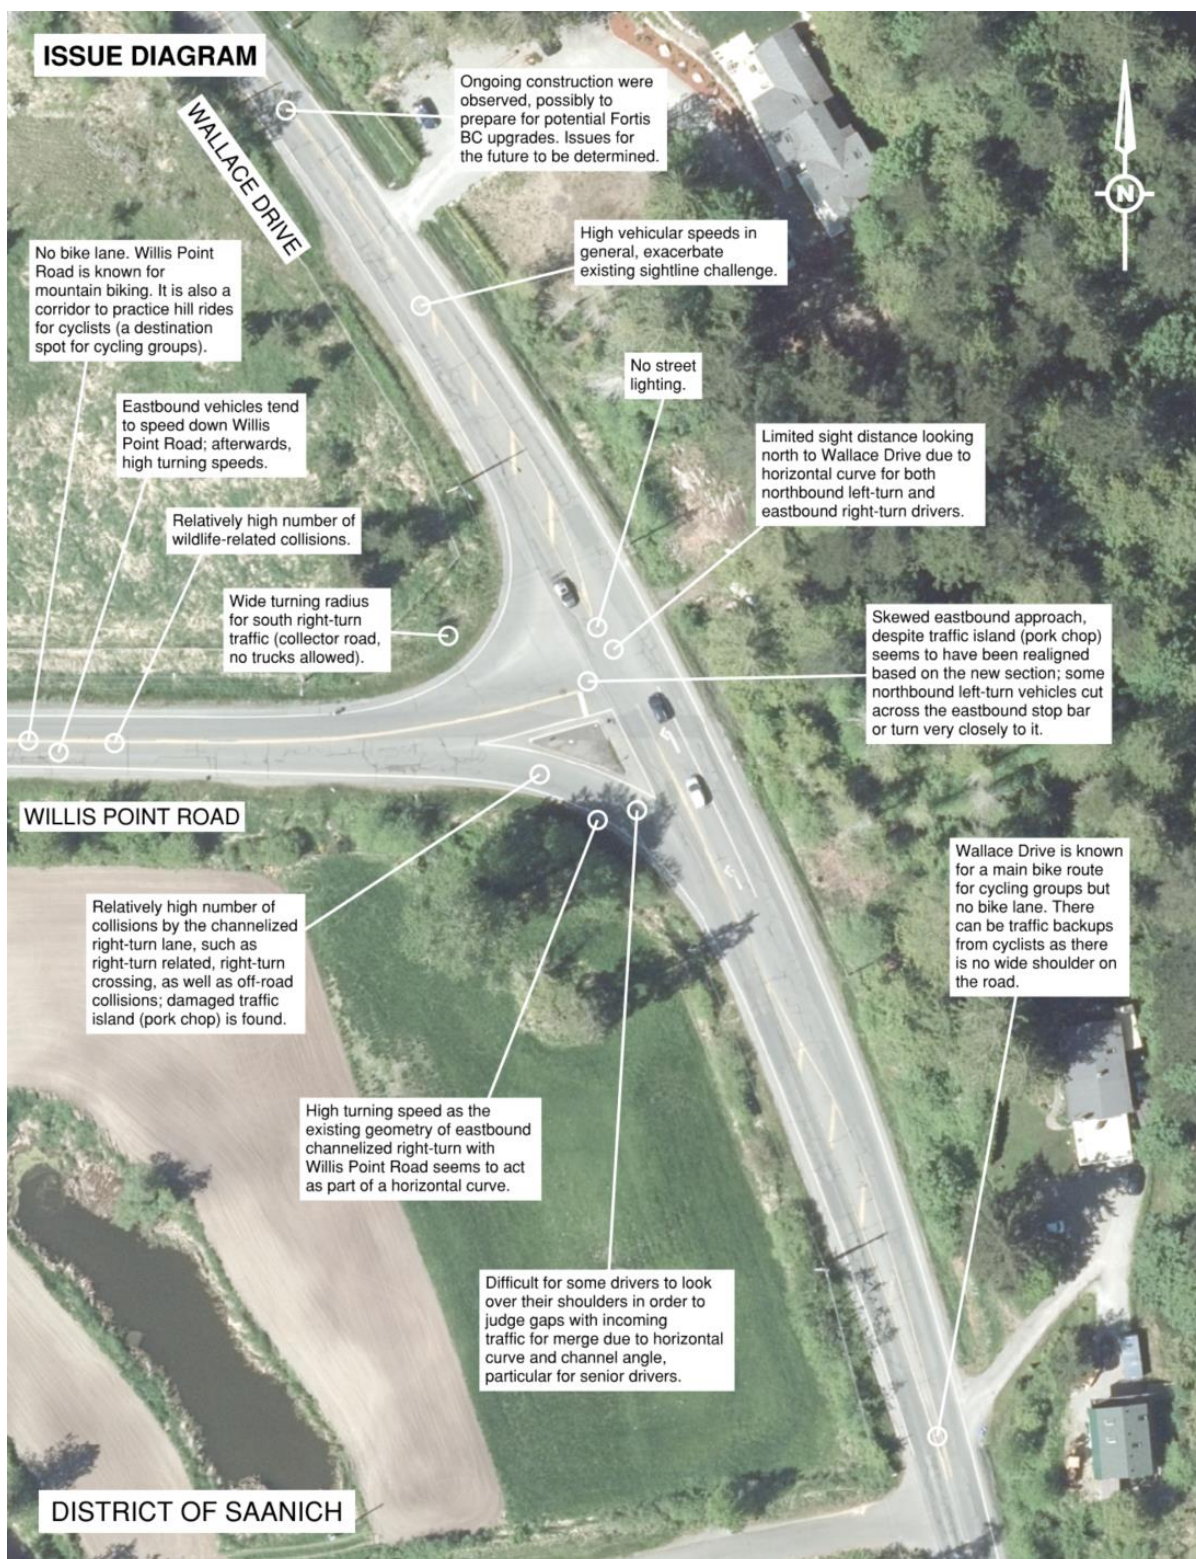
Identified Road Safety Issues – Willis Point Road at Wallace Drive
